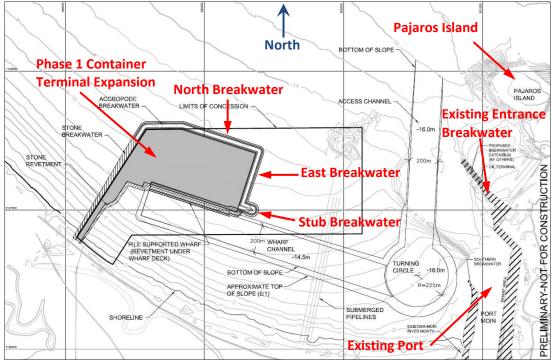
Concept layout plan for the first phase of the proposed expansion.
